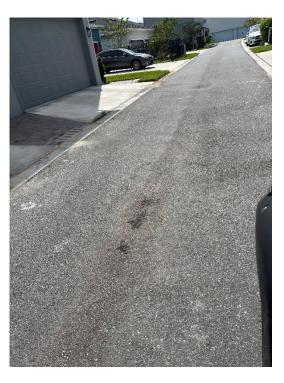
Laggett Alley-Asphalt Damage
